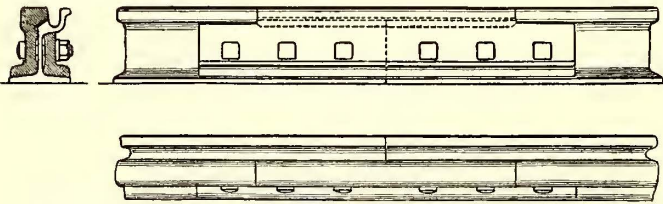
SHOWING LATER CONSTRUCTION OF RAIL-JOINT
